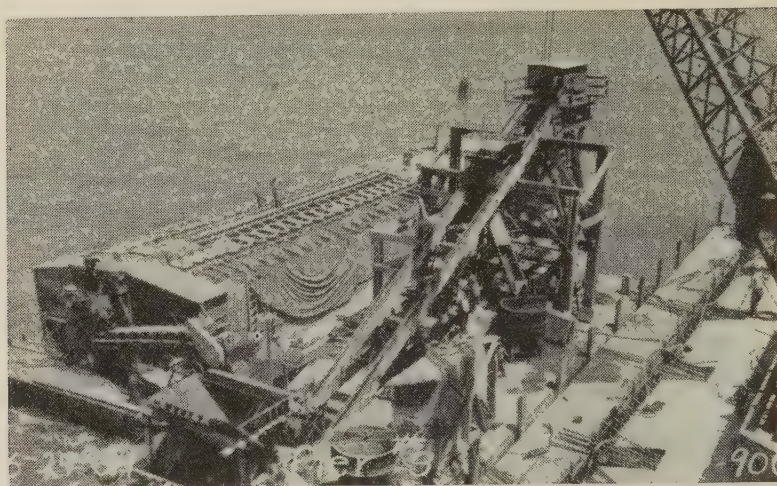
CONCRETE TRANSFER BARGE, BETWEEN MIXER BARGE AND CAISSON
